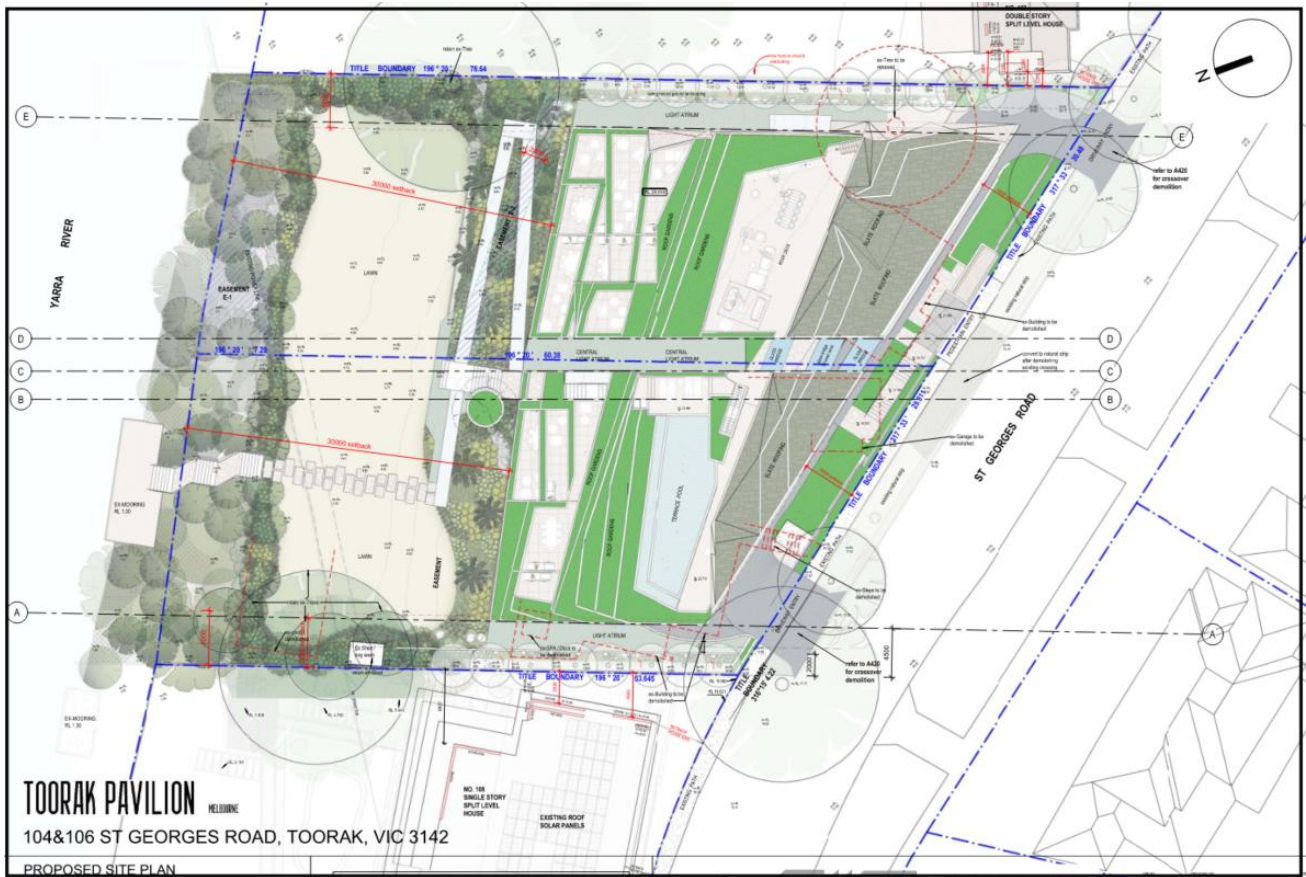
Proposed Site Plan (Reference: Charles Wright Architects)
